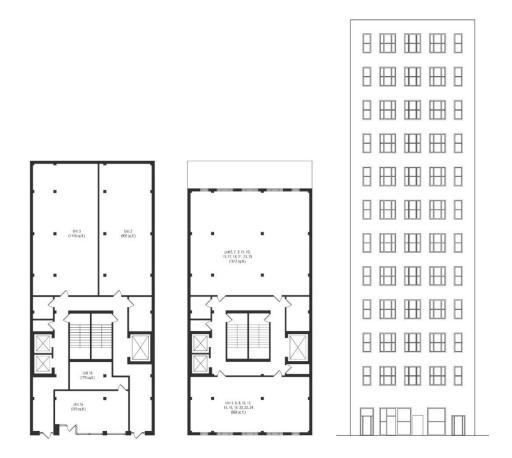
, 548, 549 (left to right) Building 18, first (ground) floor (1910); floors 2-12 (1910); (right) street-front elevation (1981). 1" = 32'. For plans, north is up.
